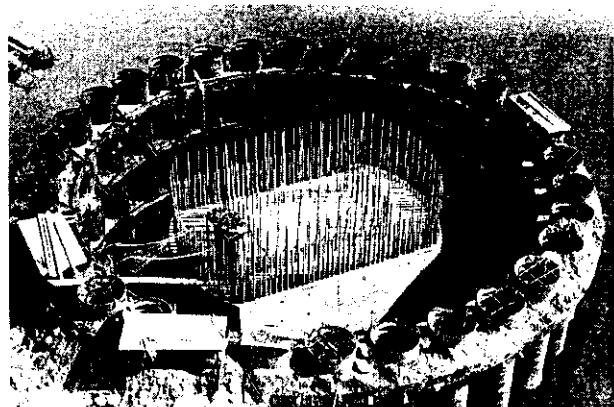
Walled steel pipe pile well method applied in heavy bridge foundation
